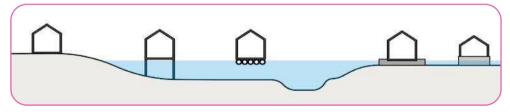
Build on higher grounds, elevated building, floating house, elevated building, consolidated structure. Patrizio Jellici 2023.
